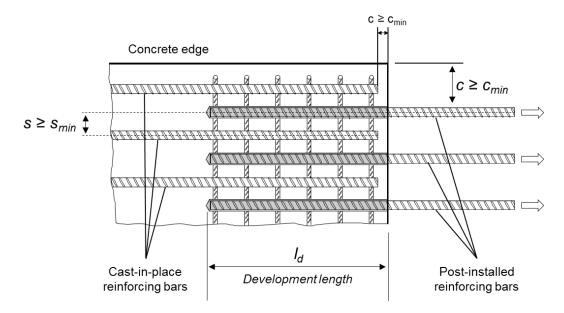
INSTALLATION PARAMETERS FOR POST-INSTALLED REINFORCING BARS
